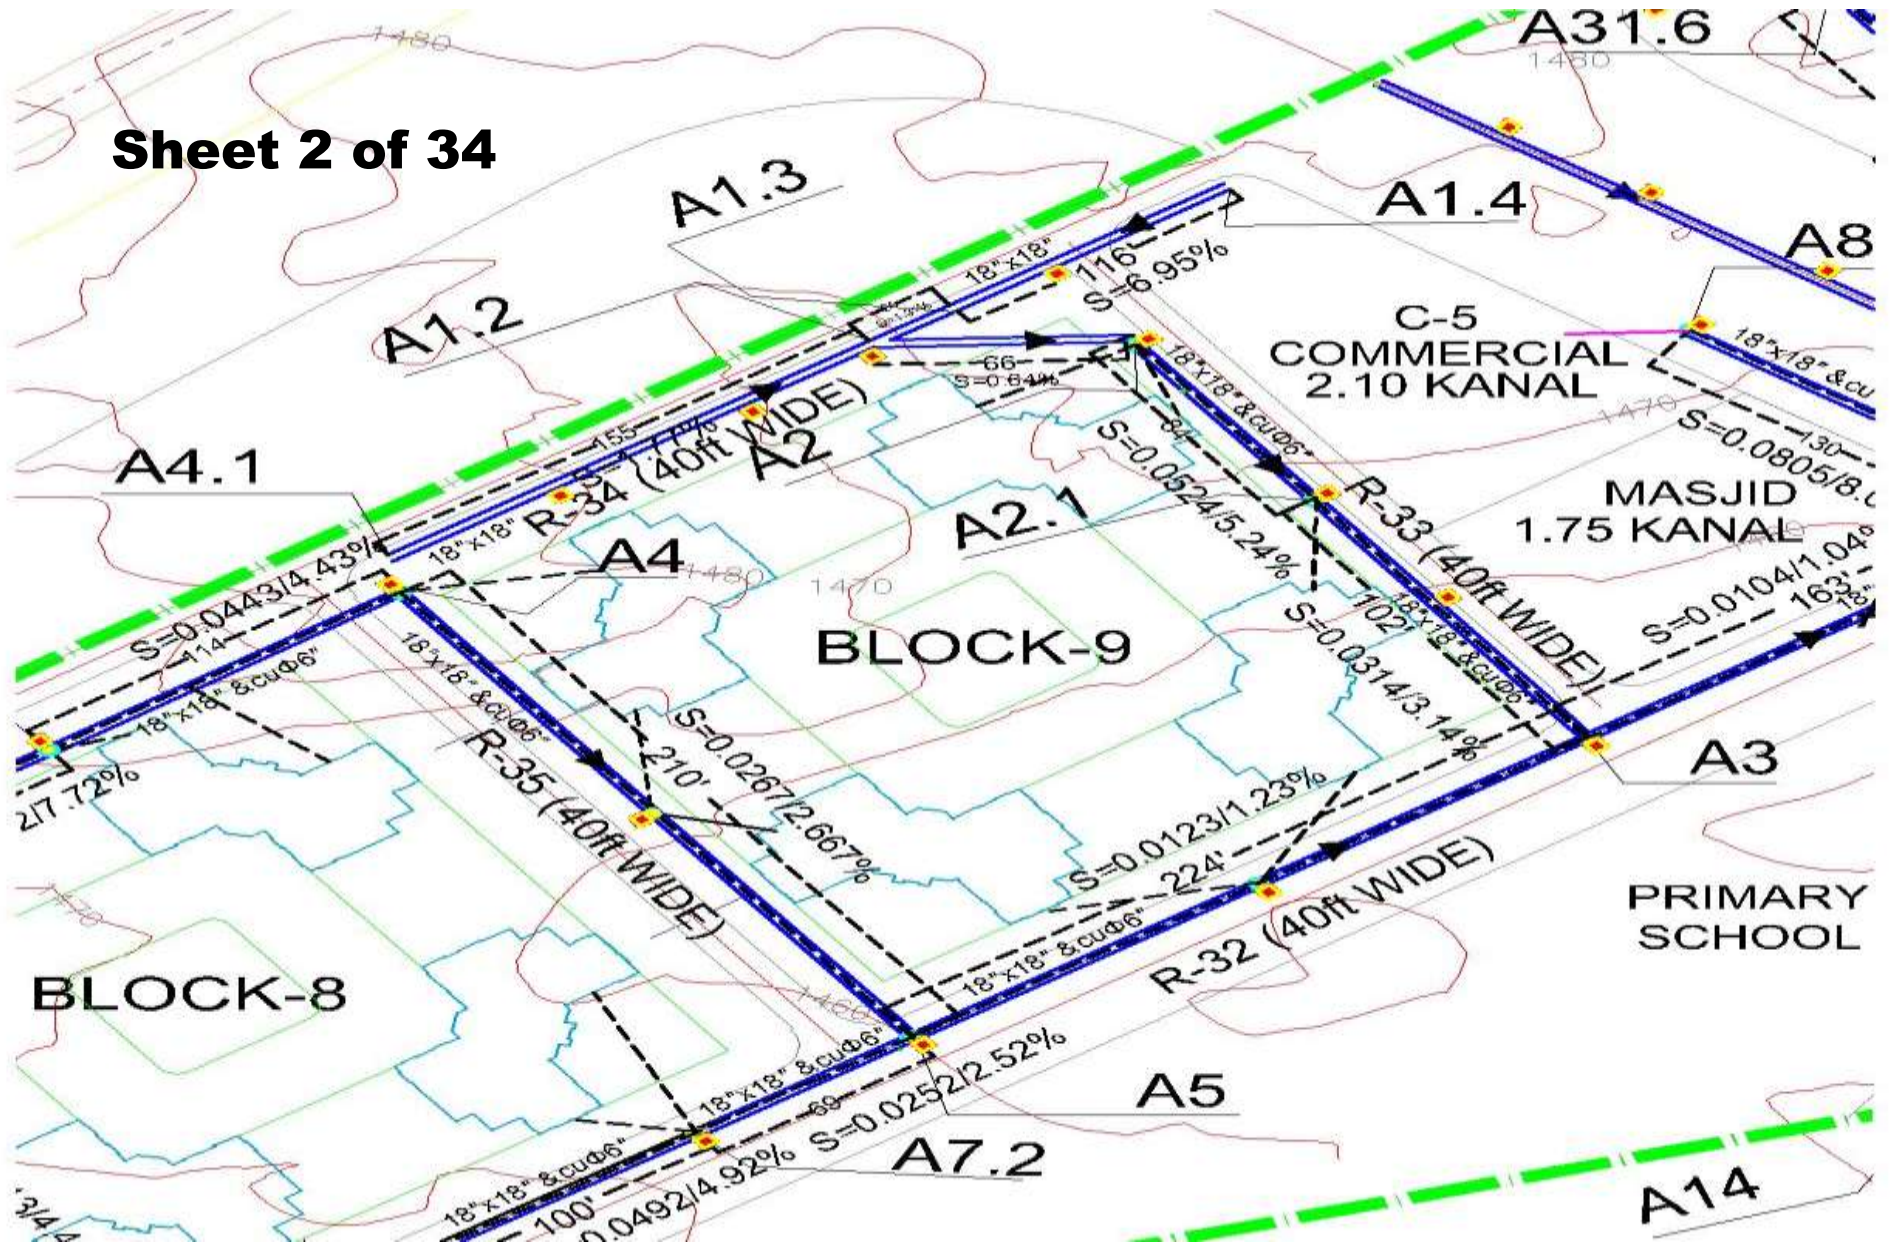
Combined drainage layout plan of Zone-1 at R/S of MR-01
